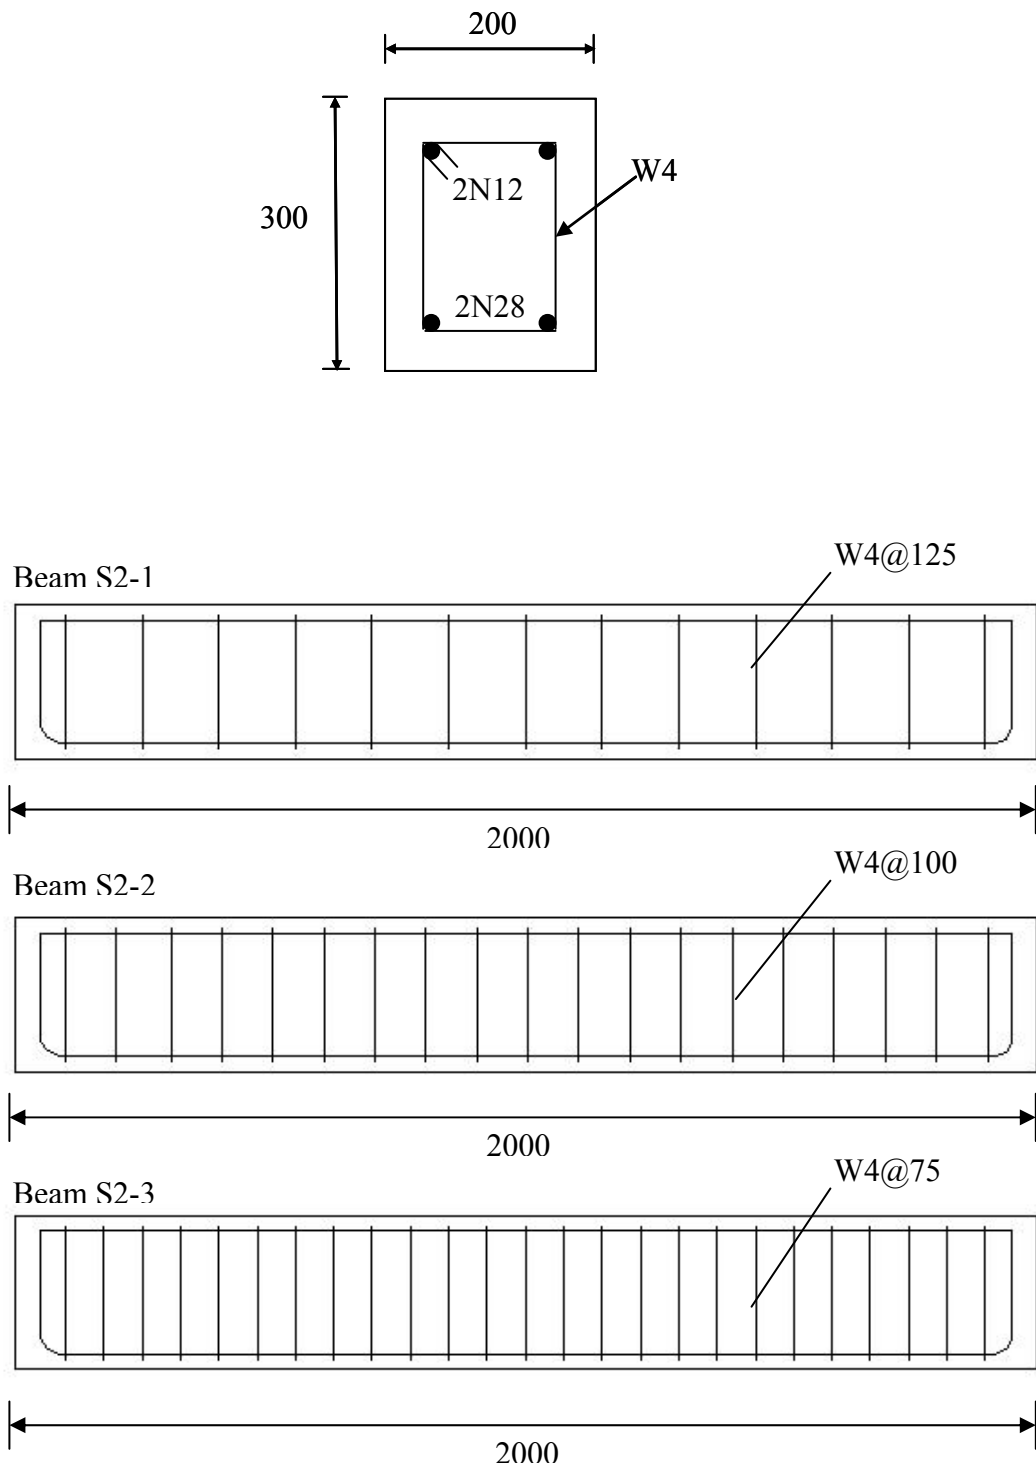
Cross-section and Elevation View of Beams for Series 2
